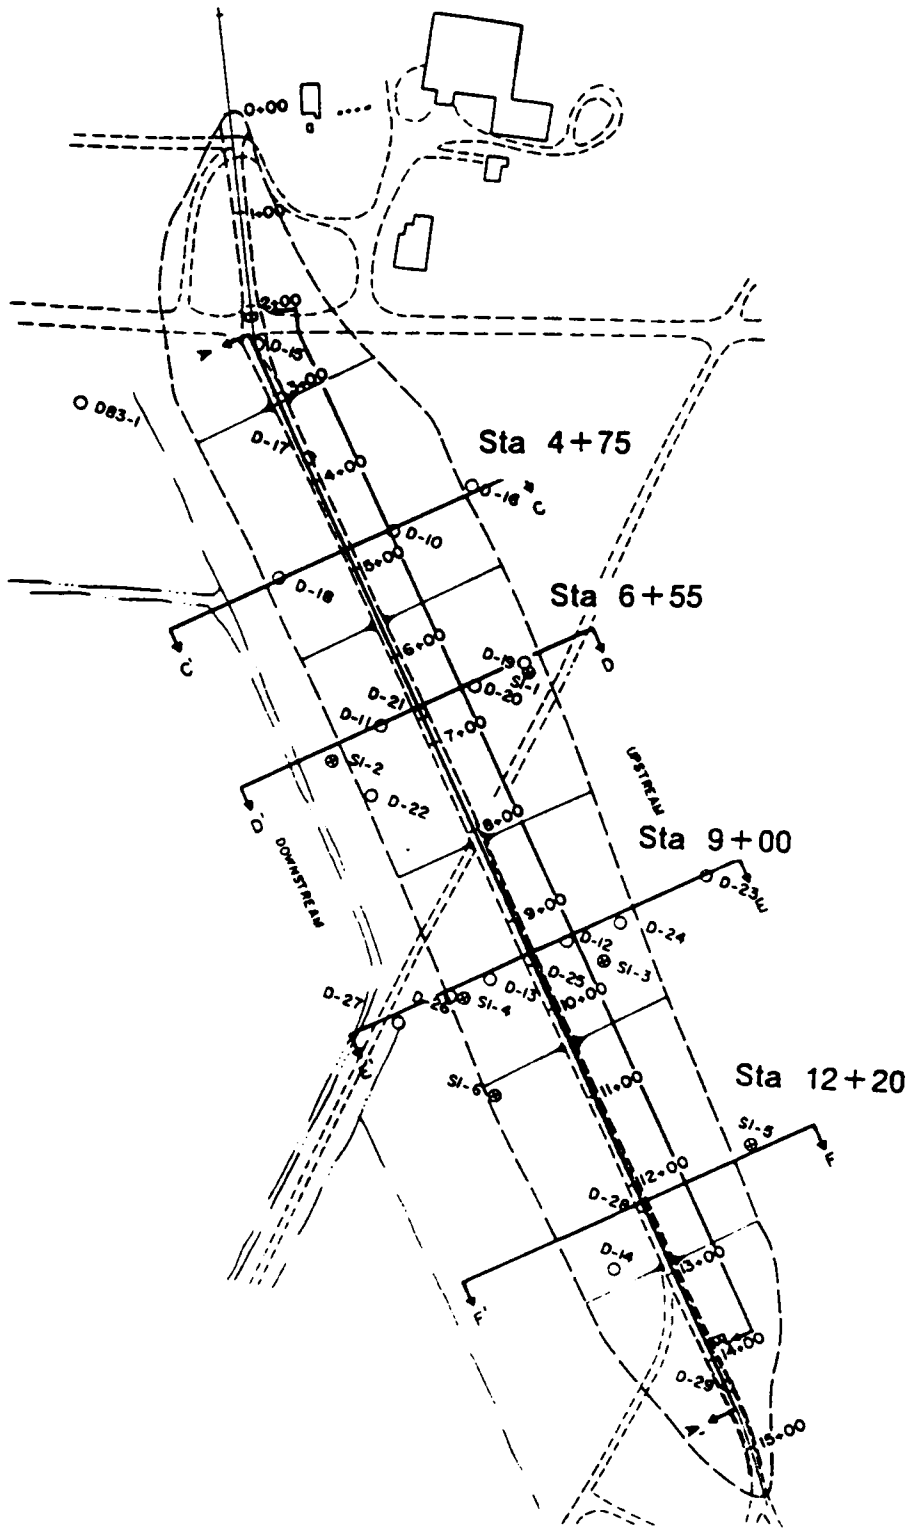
Plan view of the dike and location of the four instrumented sections (adapted from Project Plans).
